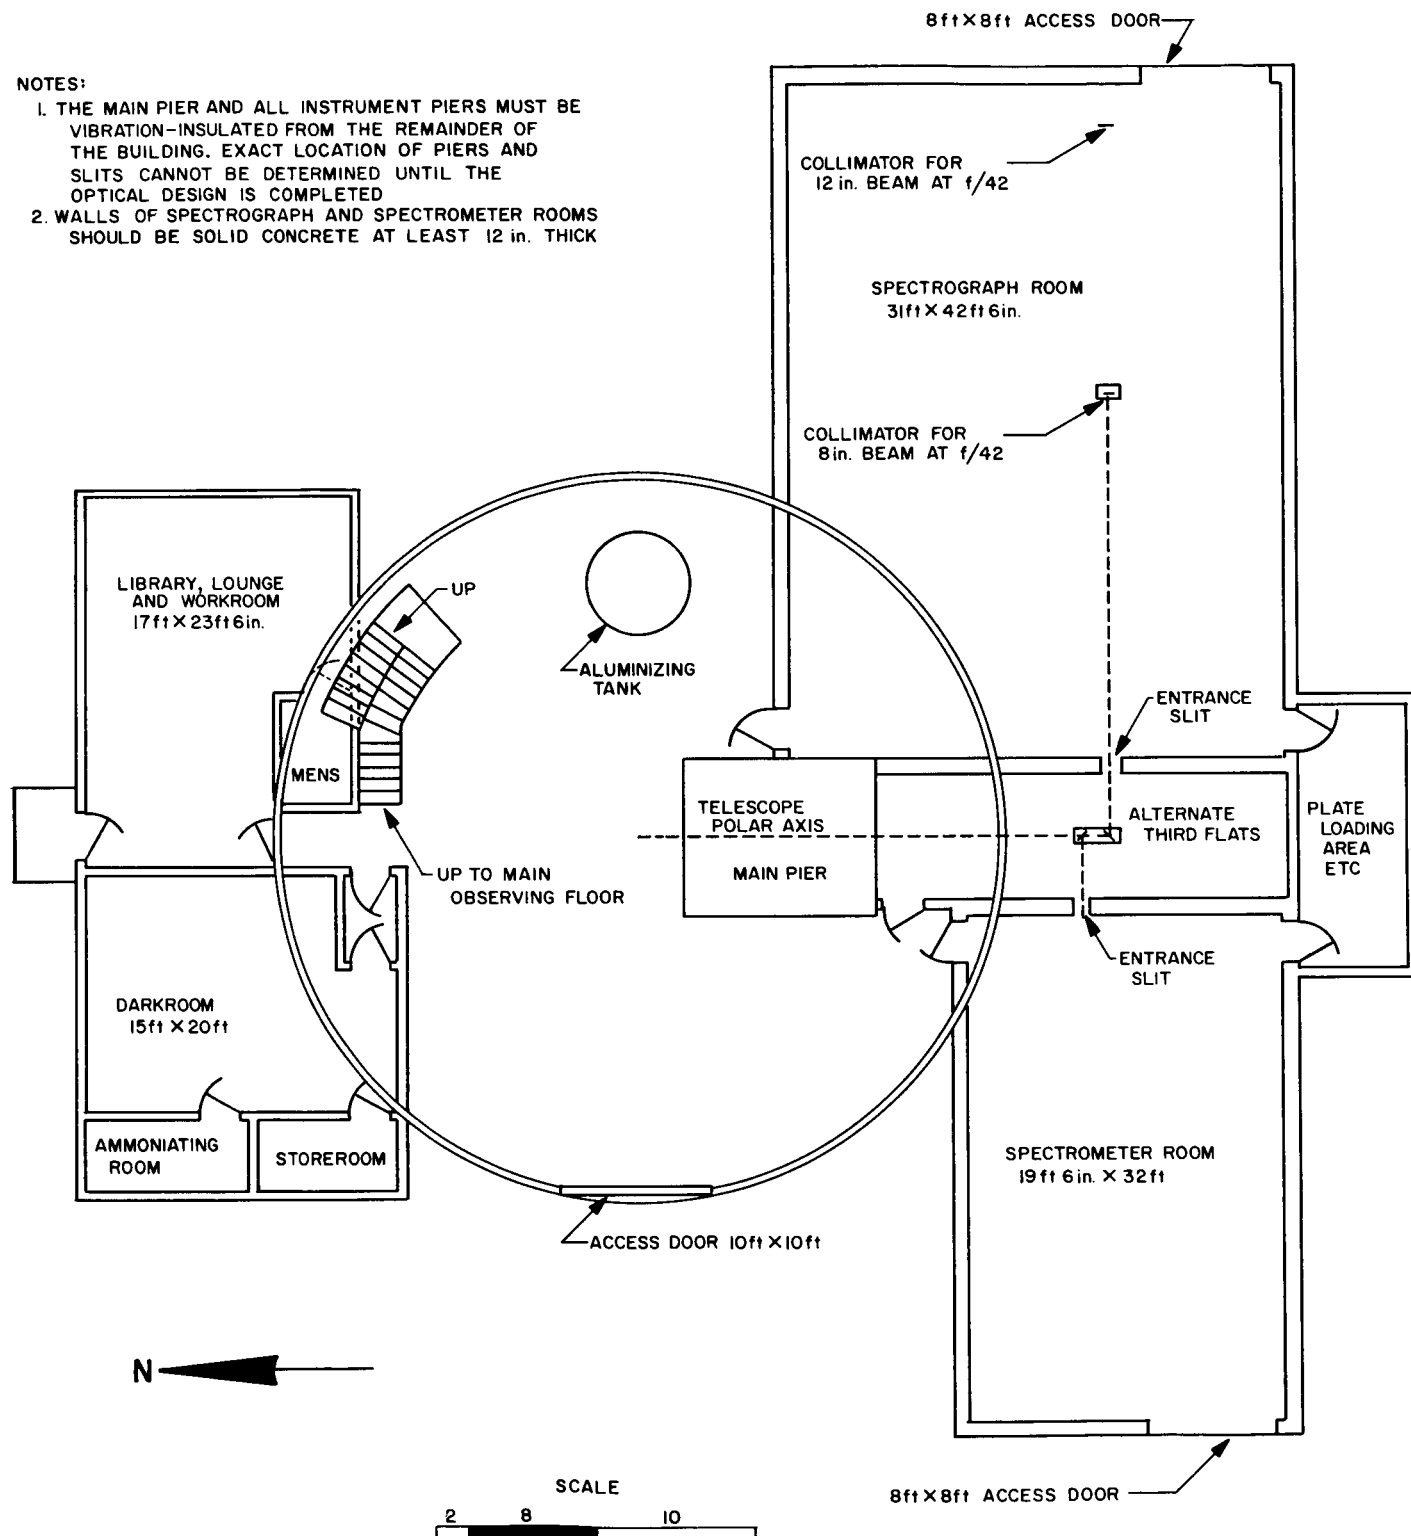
Schematic drawing of telescope dome and associated Coudé rooms, etc., plan view
